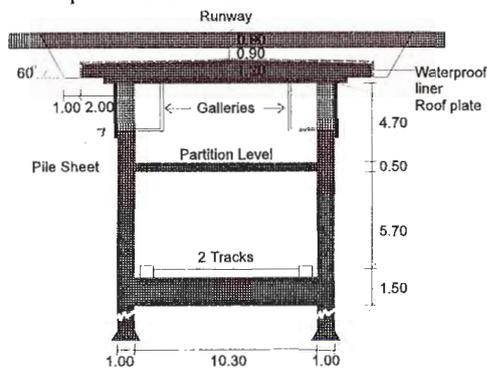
Undercutting beneath a Sub-terrain Roof Plate (all measures in metre).
